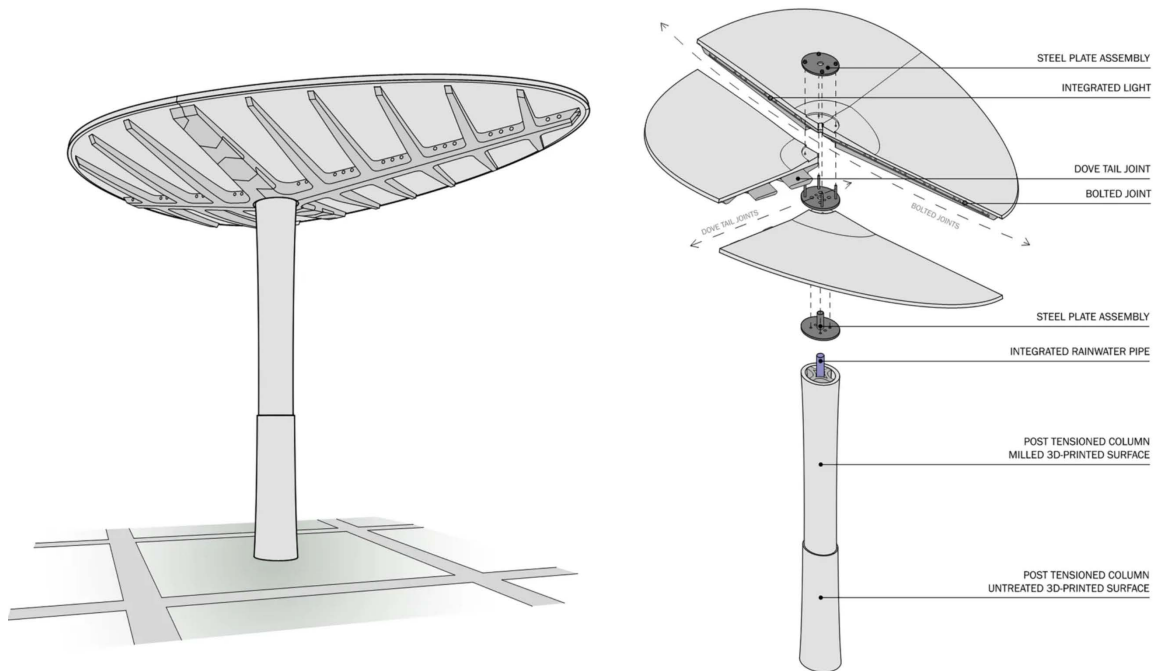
The principal assembly components of the canopy section and the column, taken from [70].
